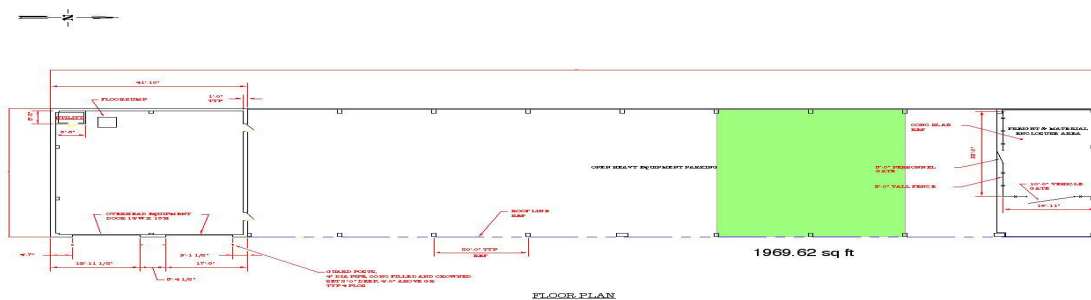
Radioactive Waste Management Complex WMF-609 maintenance facility storage shed floor plan.
